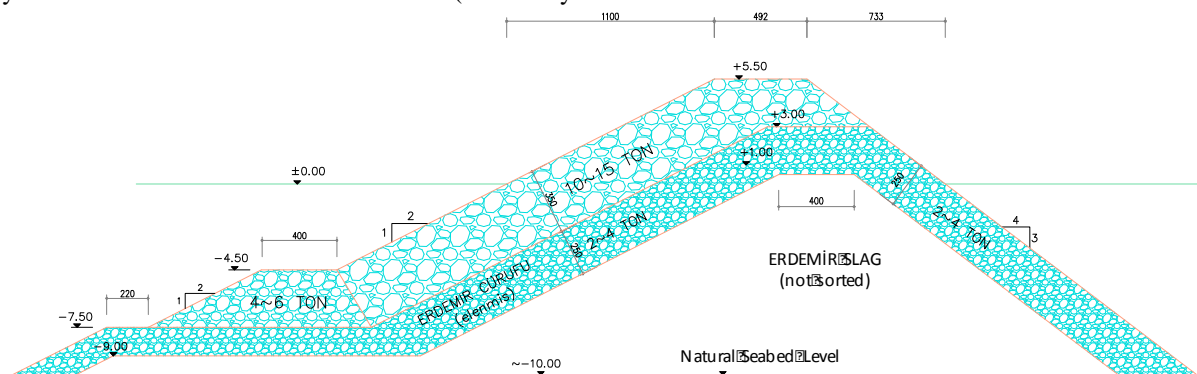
The ER breakwater model with core made of steel slag from Erdemir facility. Given are prototype dimensions in m, model was scaled to 1/48.
